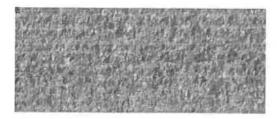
Photo of the surface texture of a groove cut with a grinder-type cutting head.
